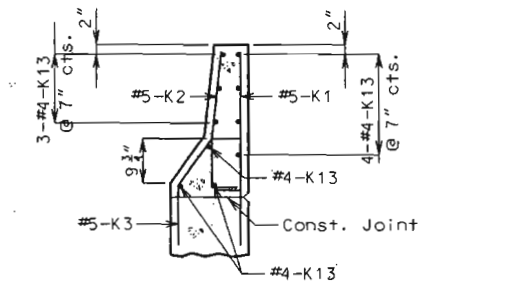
DETAILS OF SAFETY BARRIER CURB AT END BENTS
